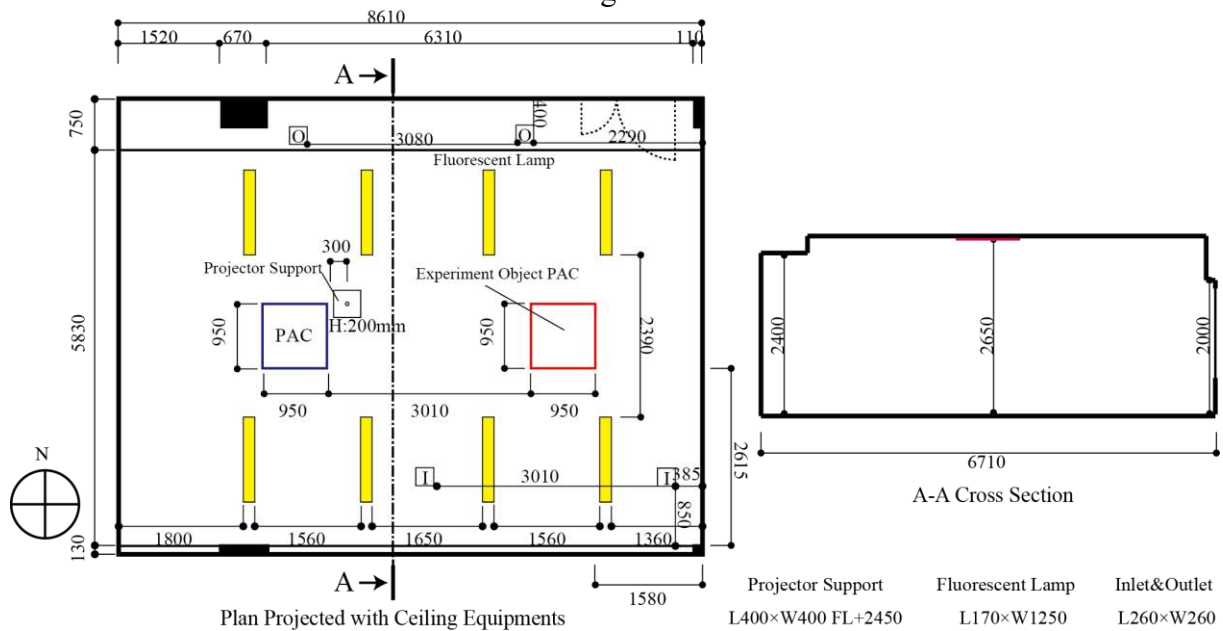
Cross section and reflecting ceiling plan of the experimental room
